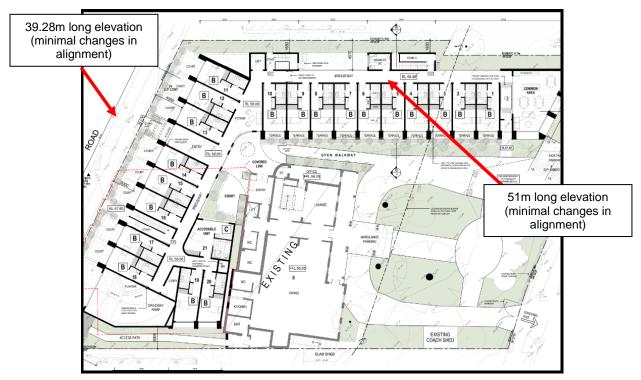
Proposed Ground Floor - Facade lengths (Source: Innovate, October 2020)
